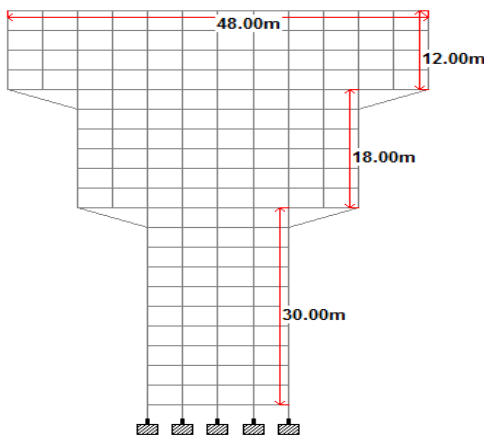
ELEVATION OF THE STRUCTURE WITHOUT BRACING AND BUNDLE TUBE
